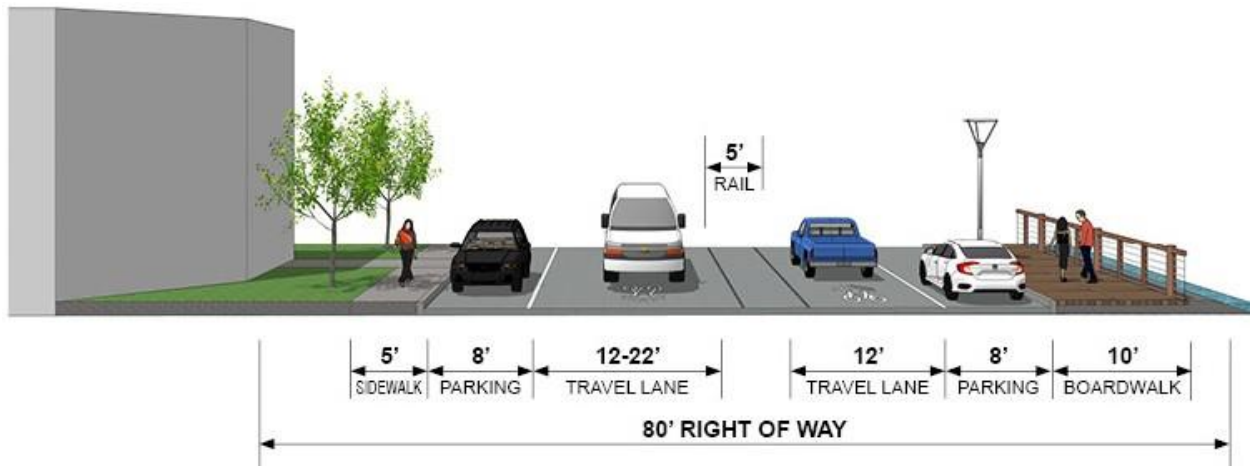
Alternative 2 - Proposed Section A (North of Date Street)
